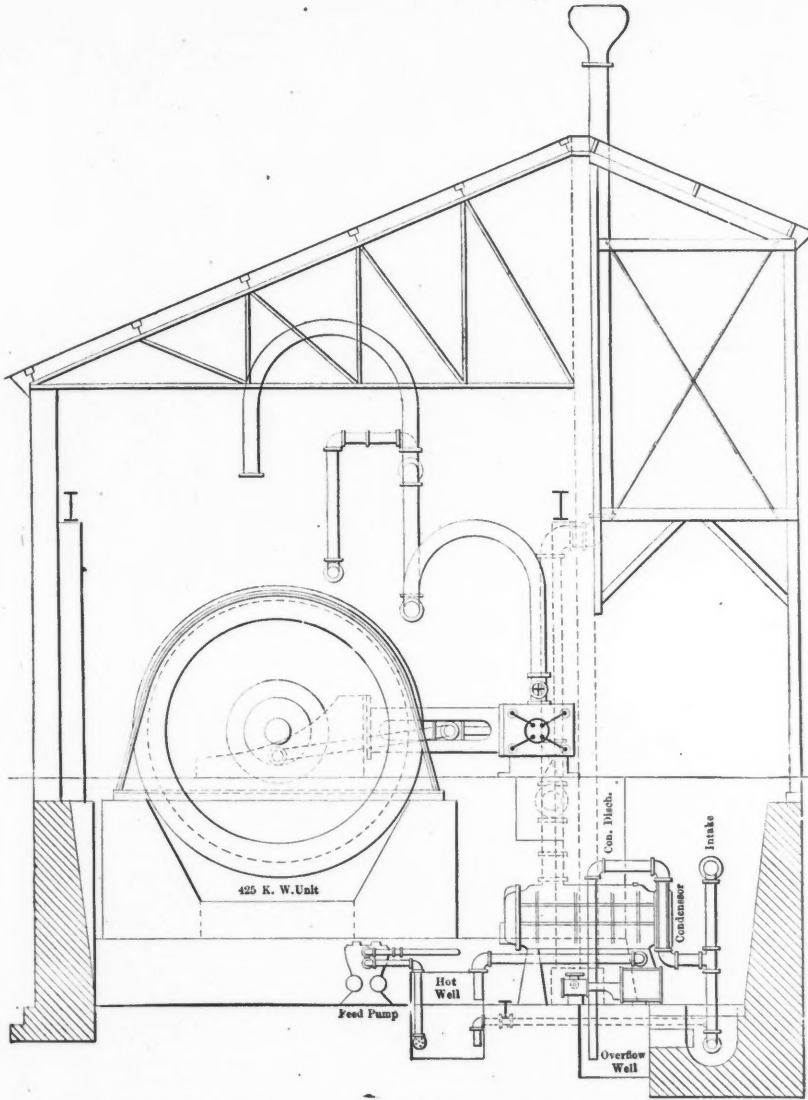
SECTIONAL ELEVATION, YAK MINING, MILLING AND TUNNEL COMPANY, POWER HOUSE
